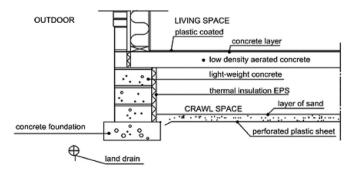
The sectional drawing of the crawl space foundation in the studied building.
